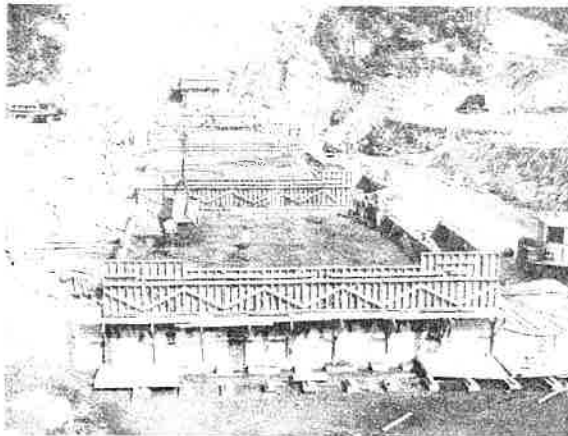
NEW KERNSVILLE DAM DURING CONSTRUCTION
